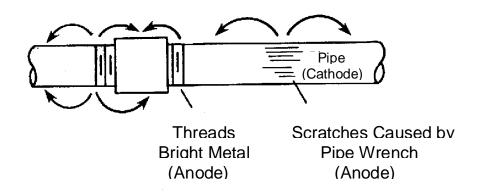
Corrosion caused by dissimilar surface conditions.
